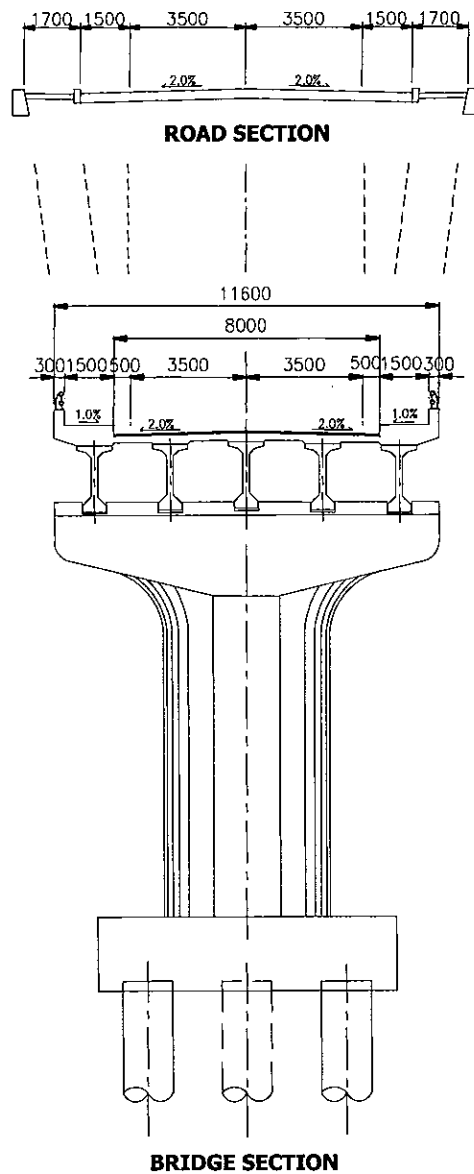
TYPICAL BRIDGE SECTION
